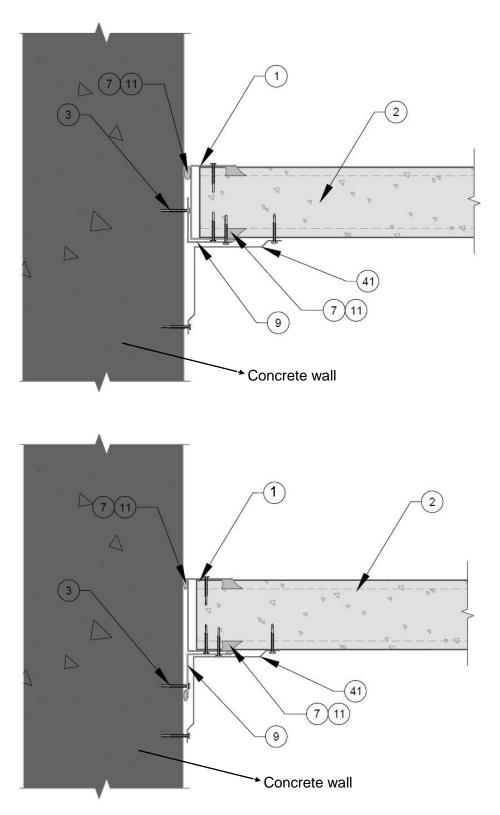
Arrangement of various Corner Details for horizontal panels supported by floor
